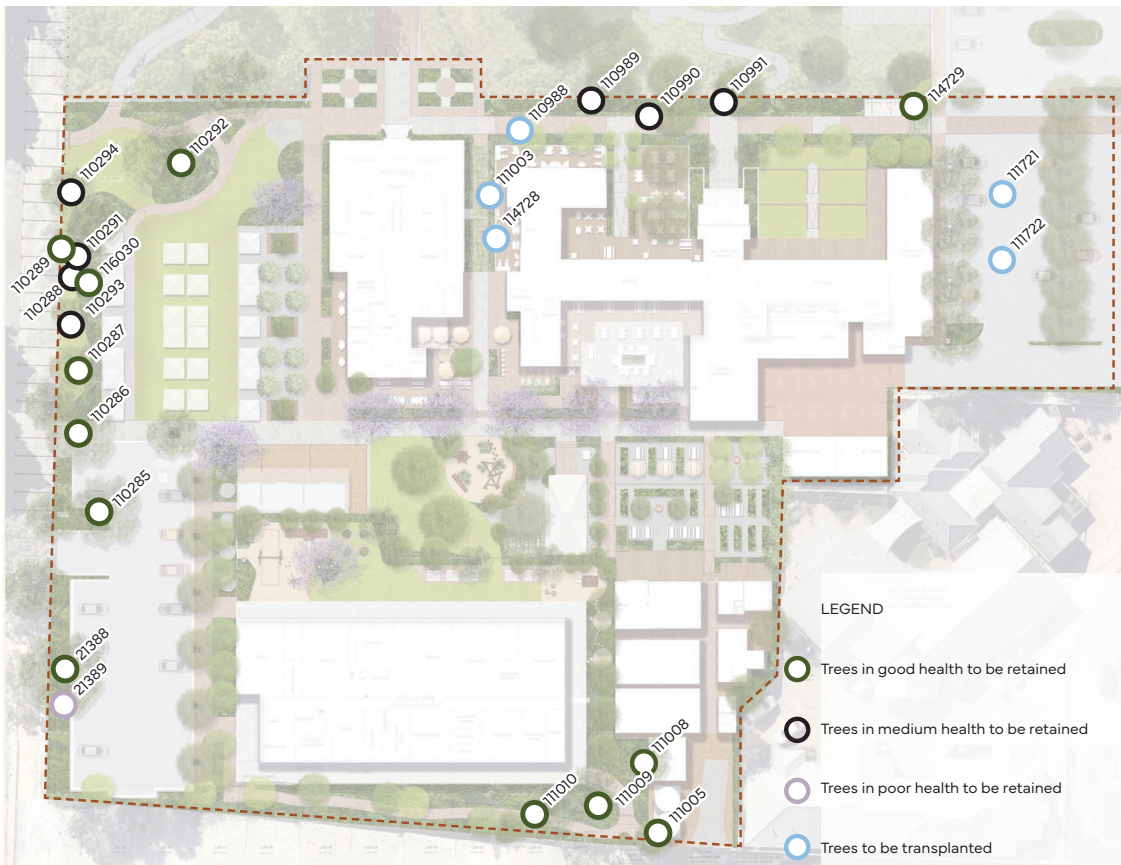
Tree Retention Plan Strategy (See Design Studio)
